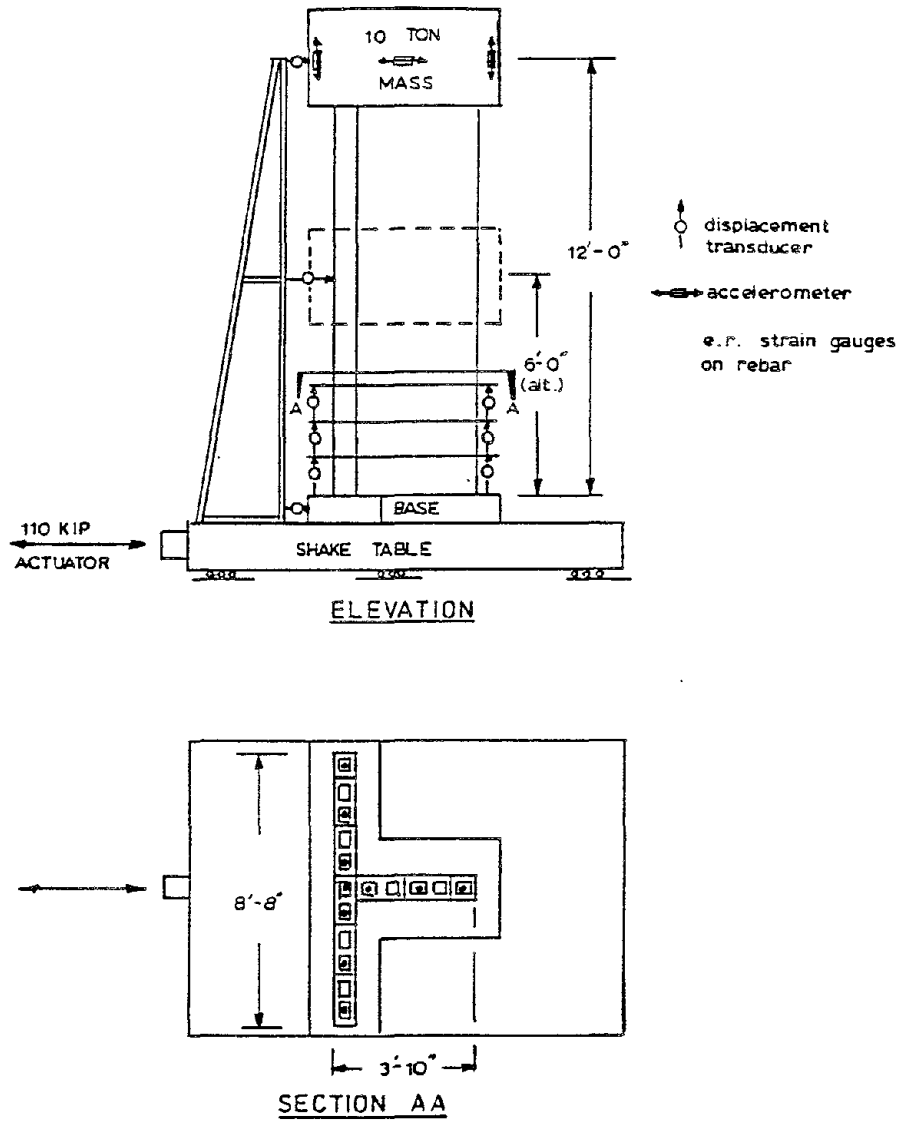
PROPOSED DYNAMIC WALL TESTS
